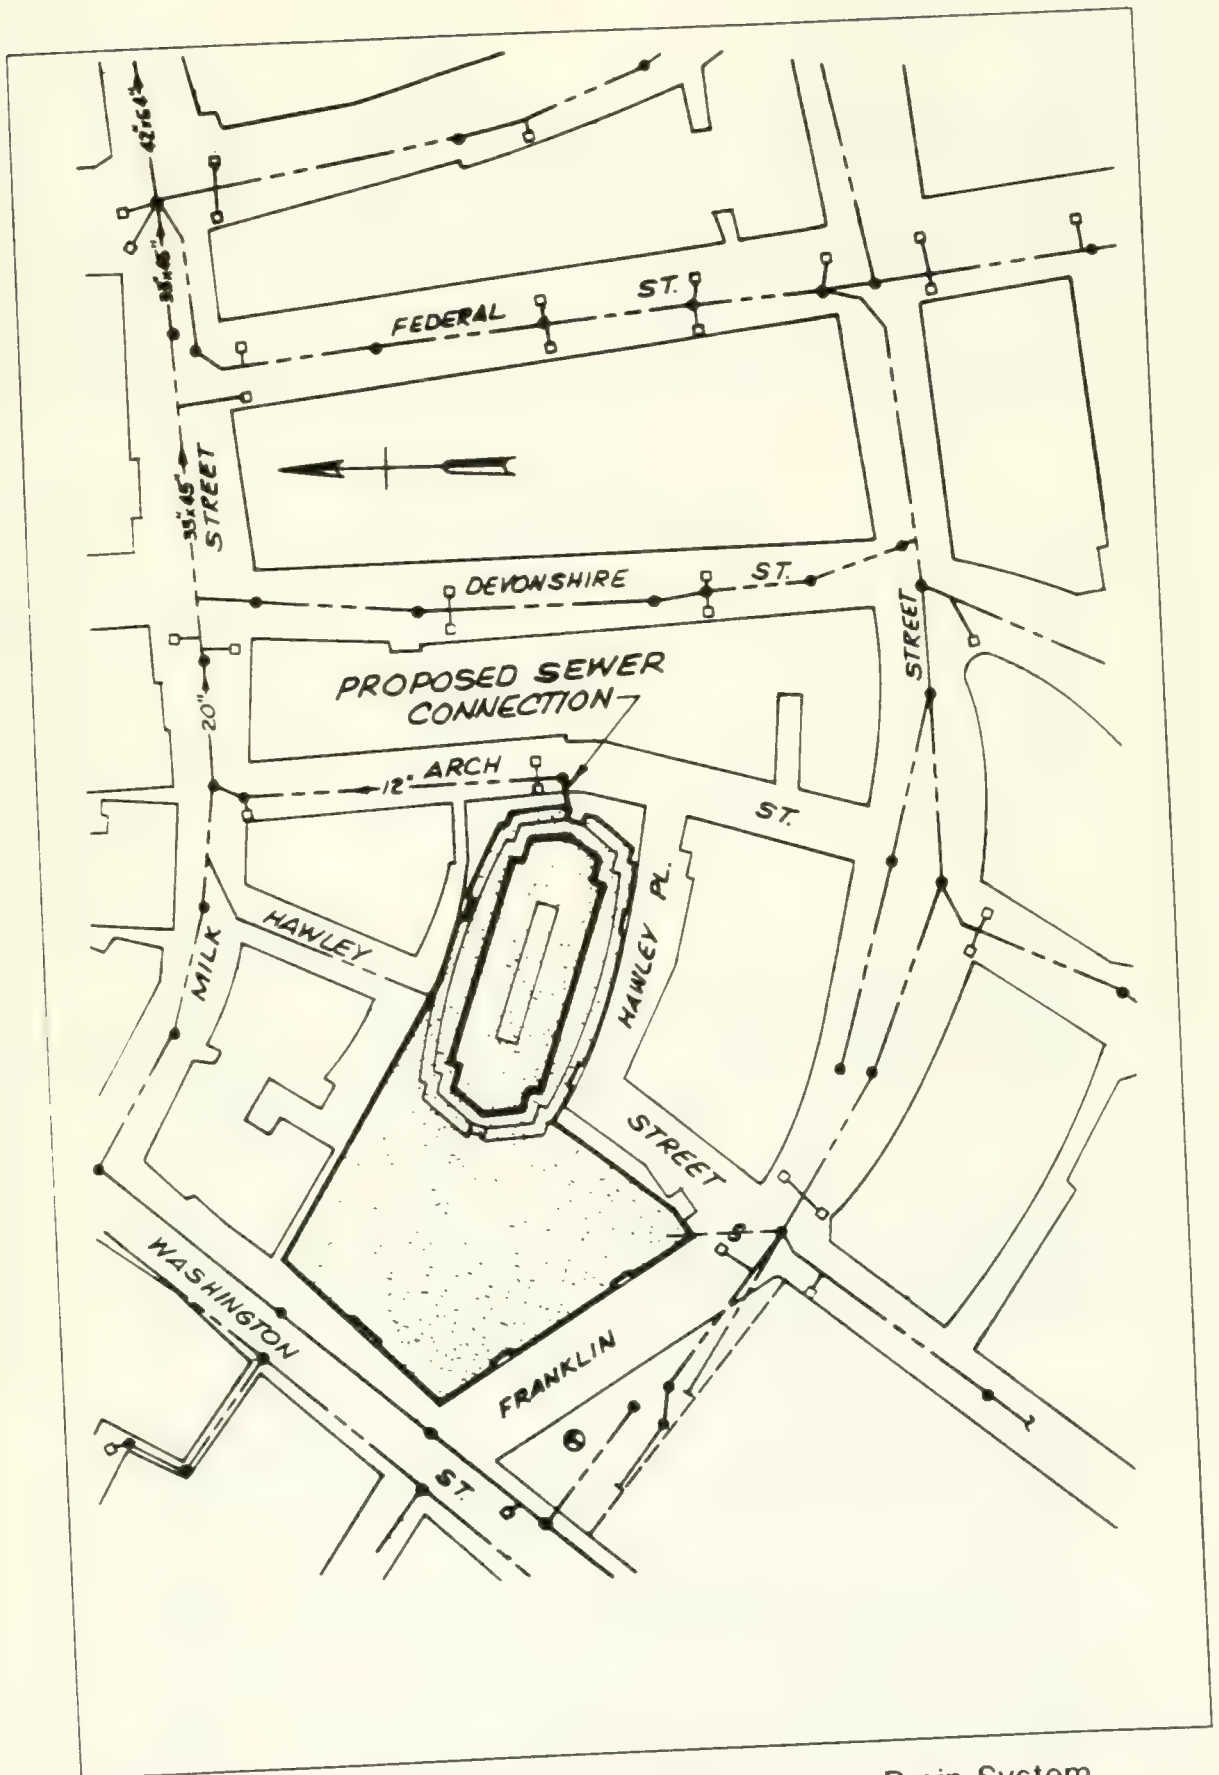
Proposed Sanitary Sewer/Storm Drain System
